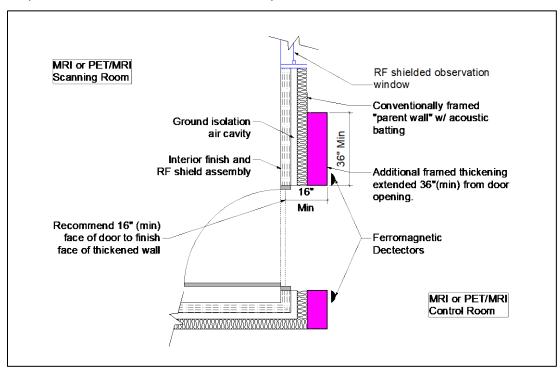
Plan detail of thickened wall at door to MRI or PET/MRI Scanning Room from Control Room with ferromagnetic detection system flanking the doorway to Zone 4.
